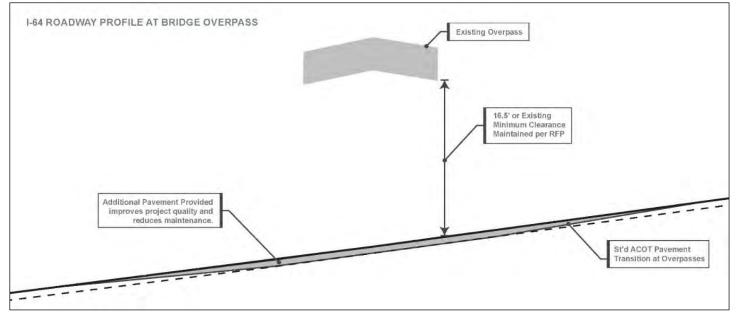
I-64 Roadway Profile at Bridge Overpass
